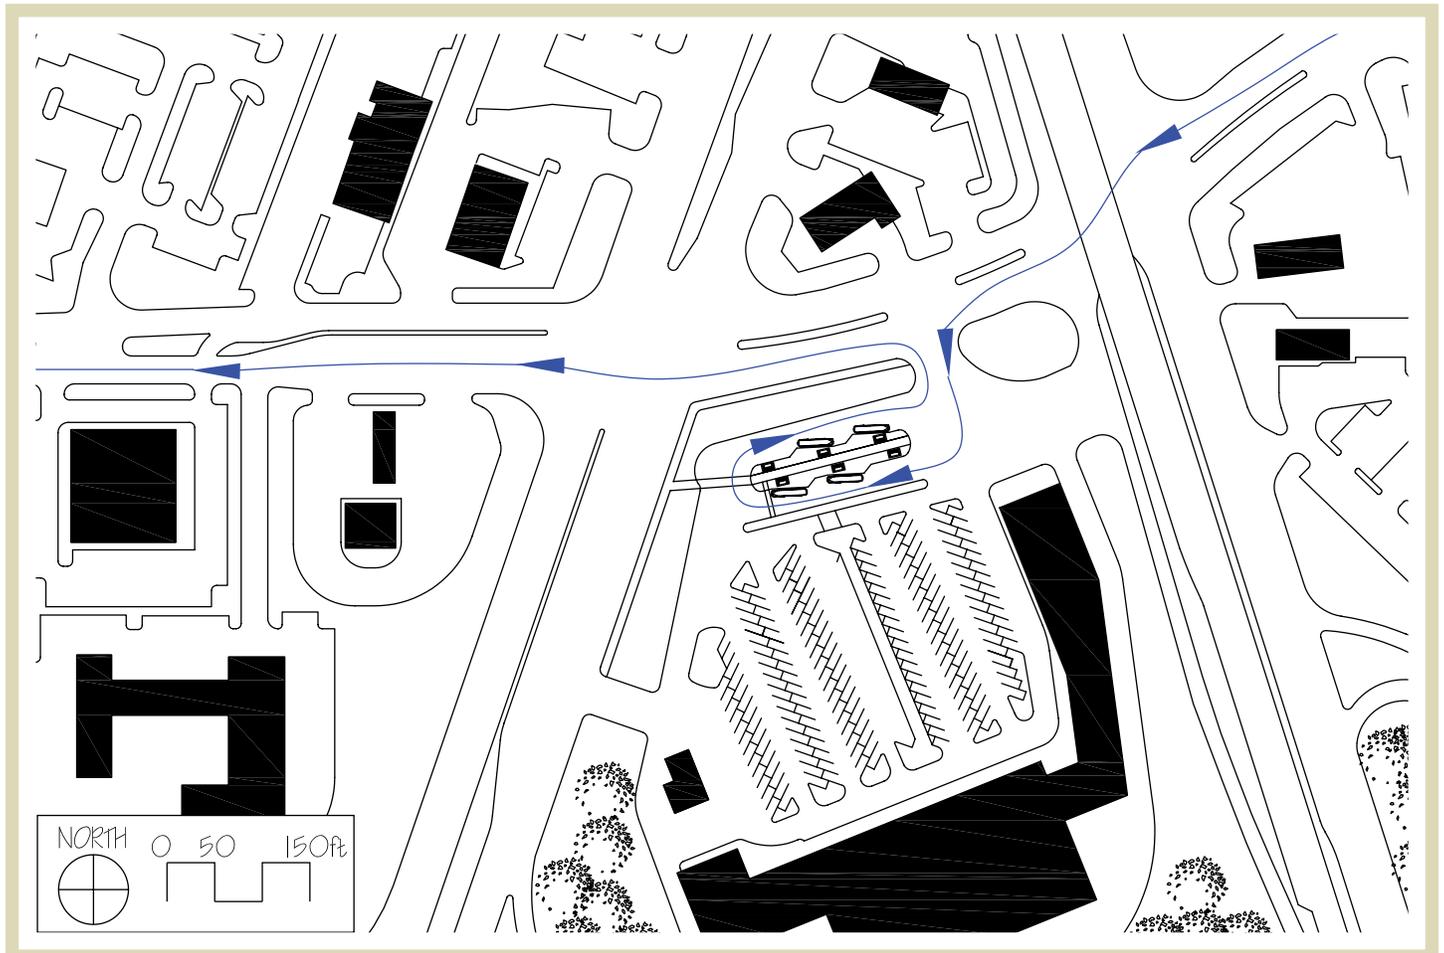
| A transit center located within a retail center near a highway interchange.
